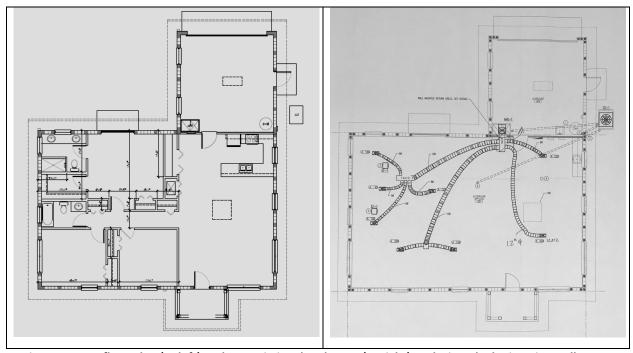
FRTF floor plan (at left) and pre-existing duct layout (at right) as designed. The interior walls were intentionally not installed.
